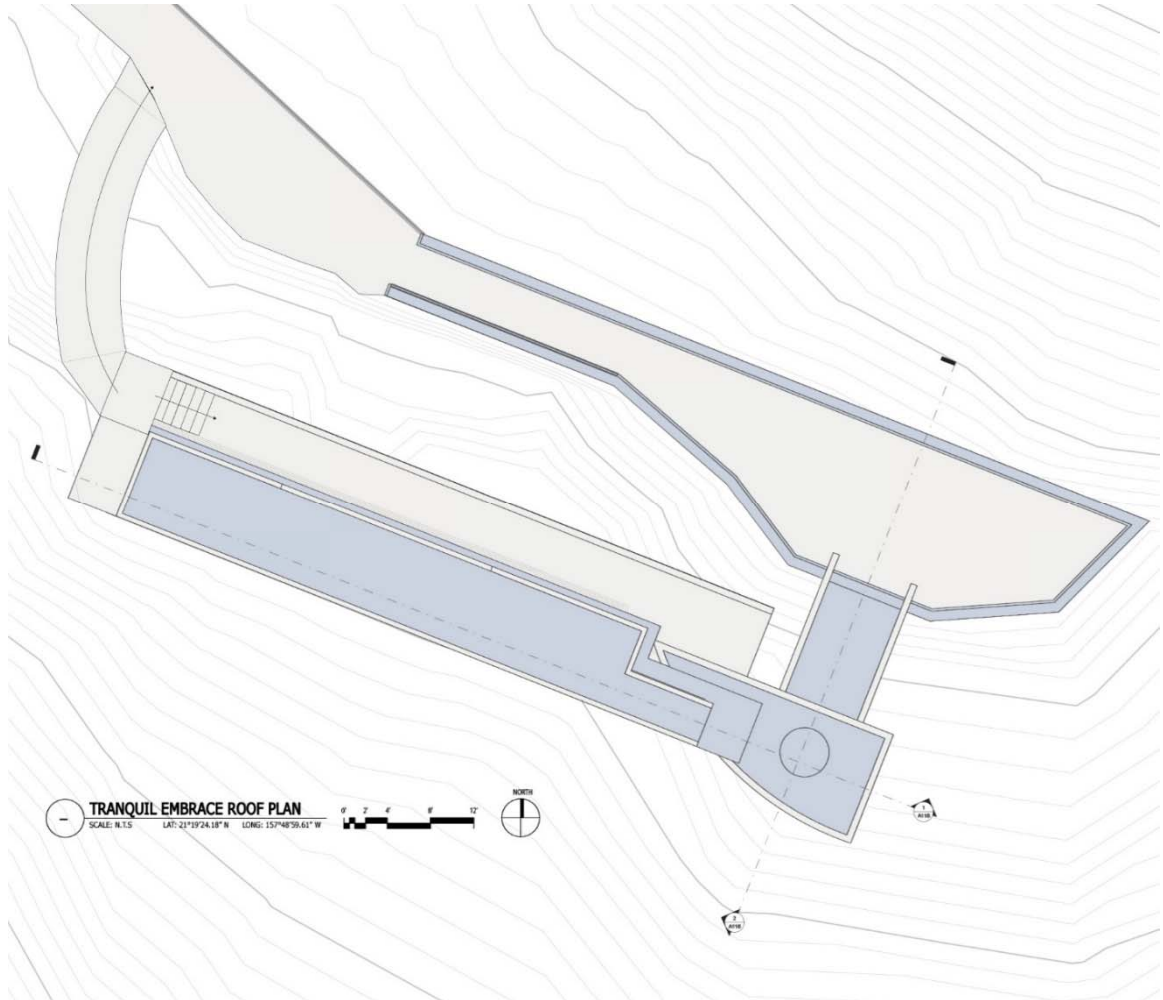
Tranquil Embrace Roof Plan. Made by Author.
